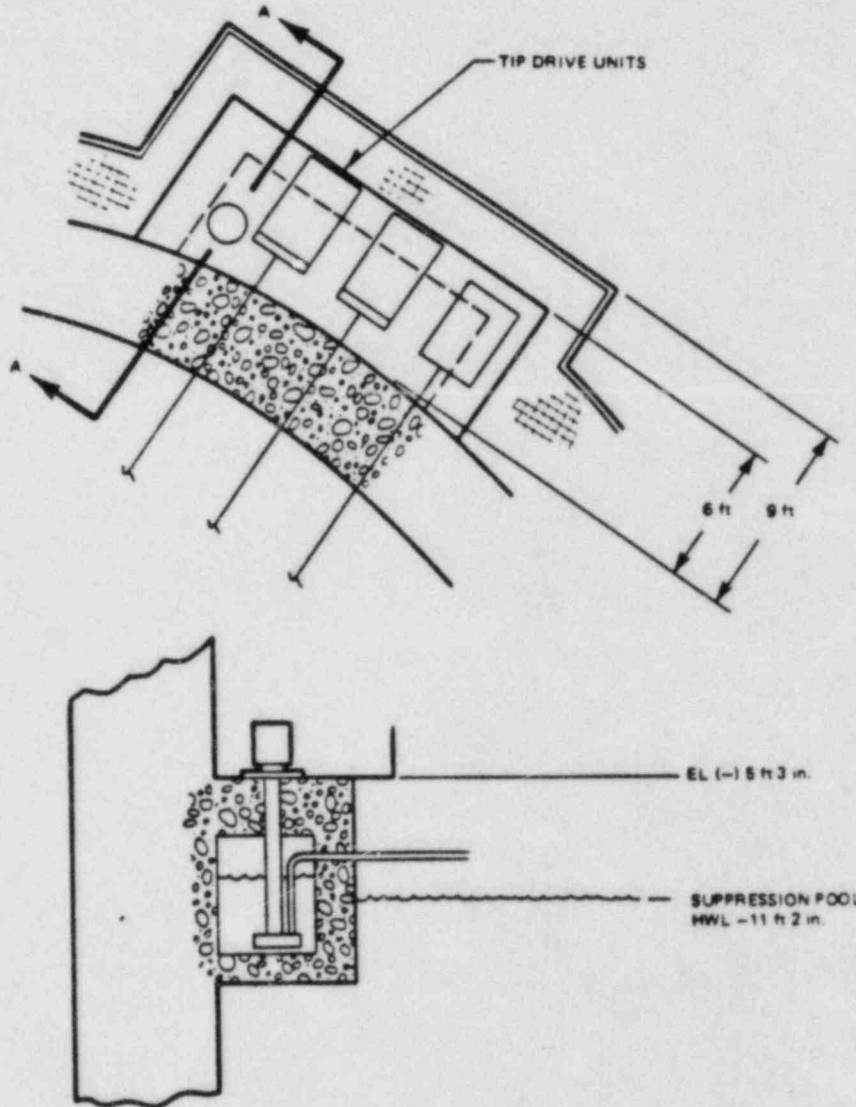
B-2. Containment Floor Drain Sump - 238 Plant
